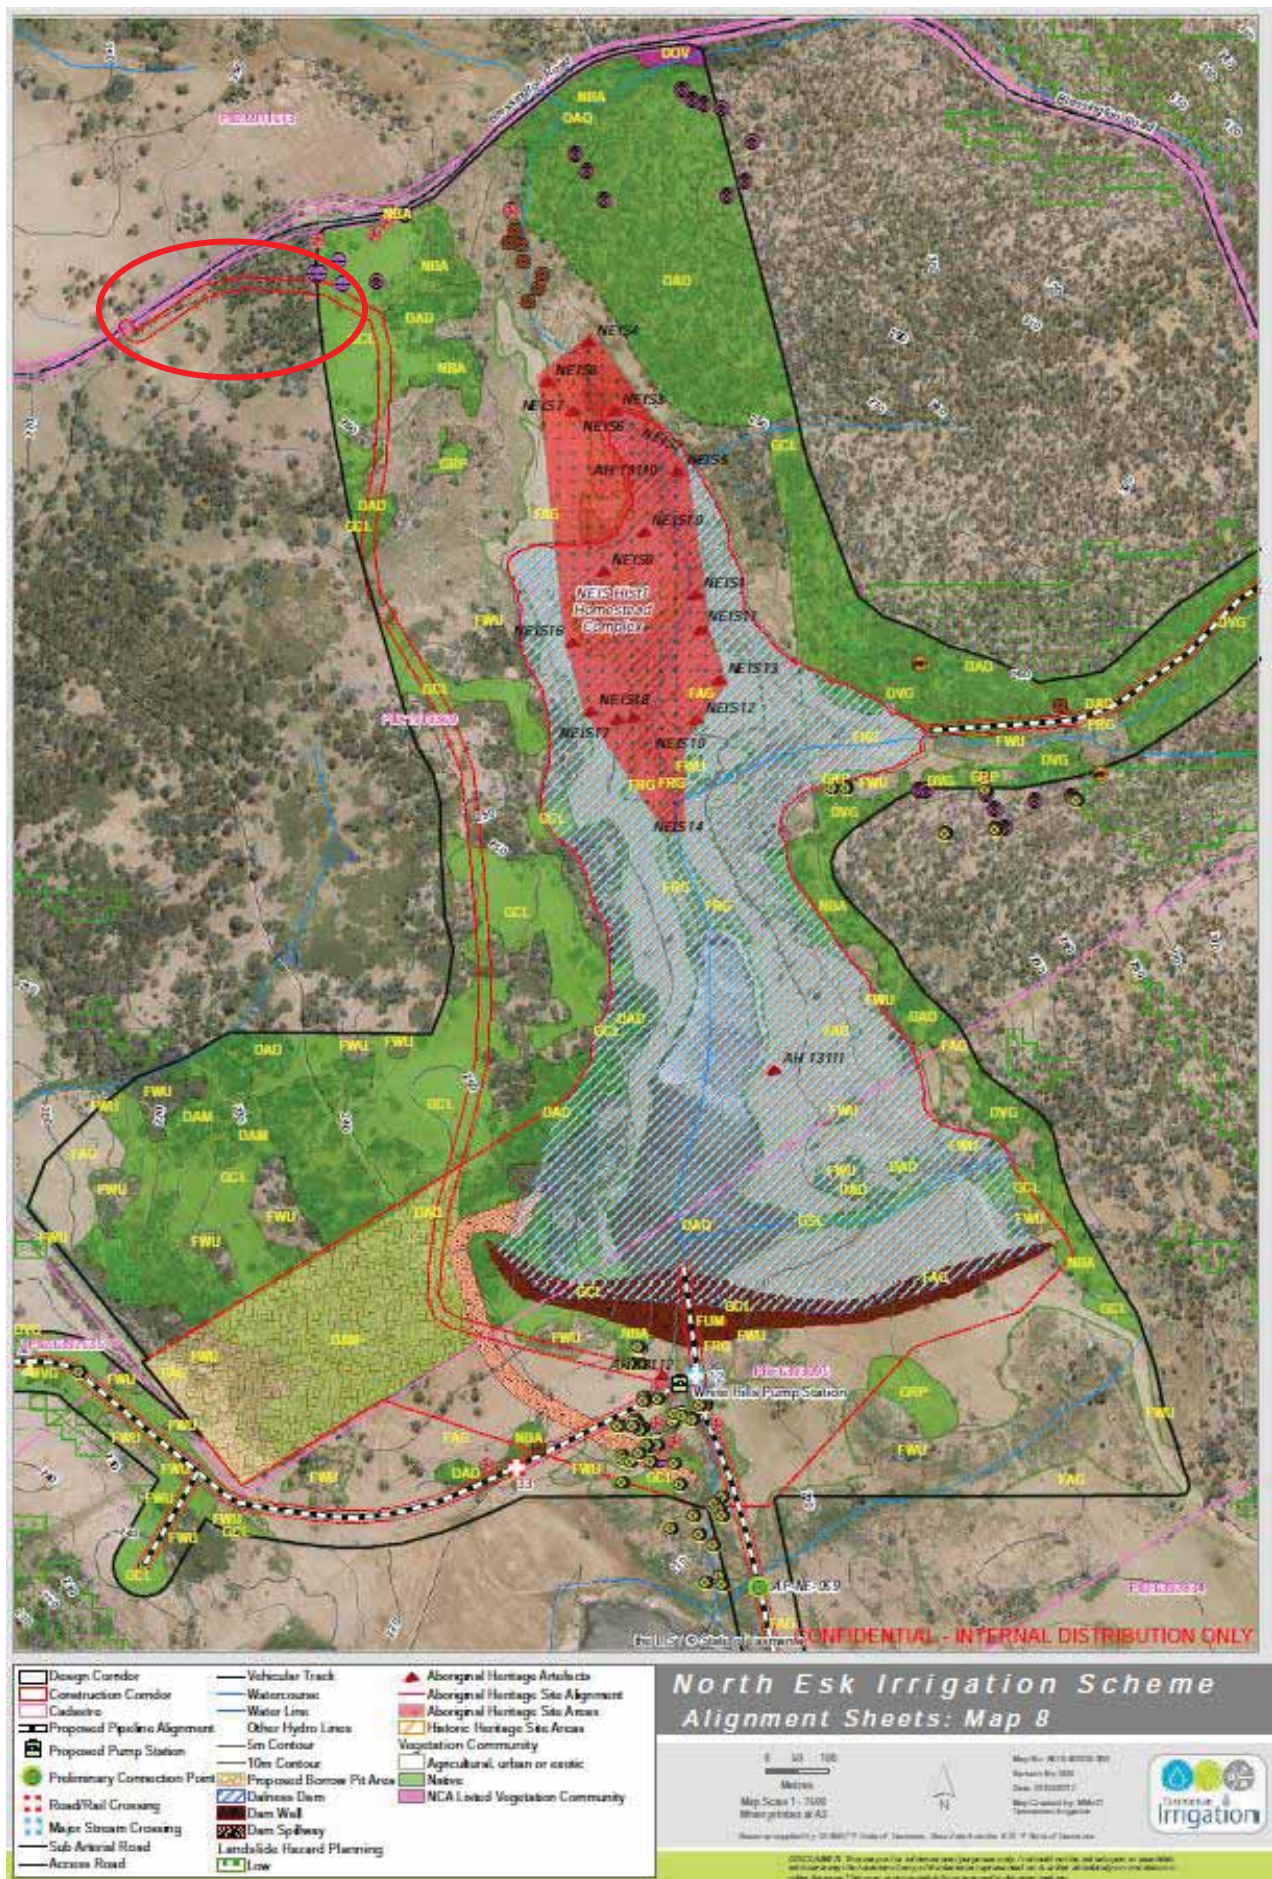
Proposed access road (red double-lined route) showing small area in northwest near Blessington Road that is not reported against in ECOtas (2017)
